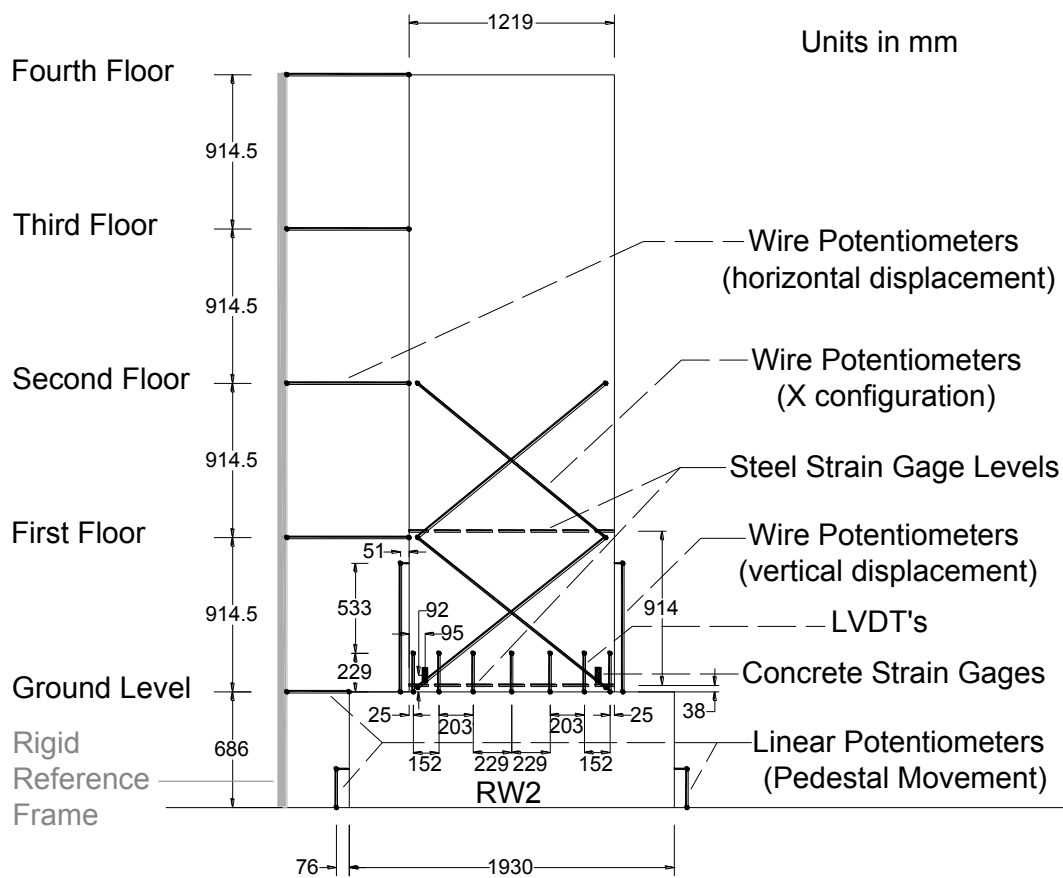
Instrumentation on the Wall Specimen (Orakcal, 2004)
